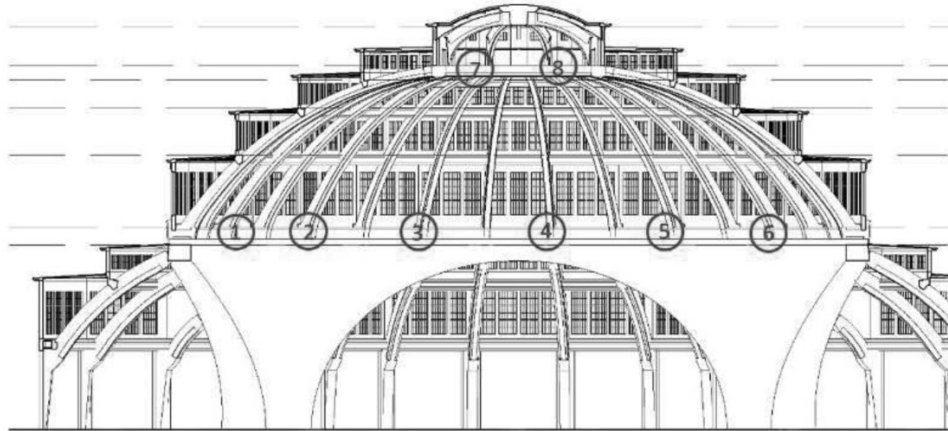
The arrangement of prisms – vertical section of the structure of the Centennial Hall.
